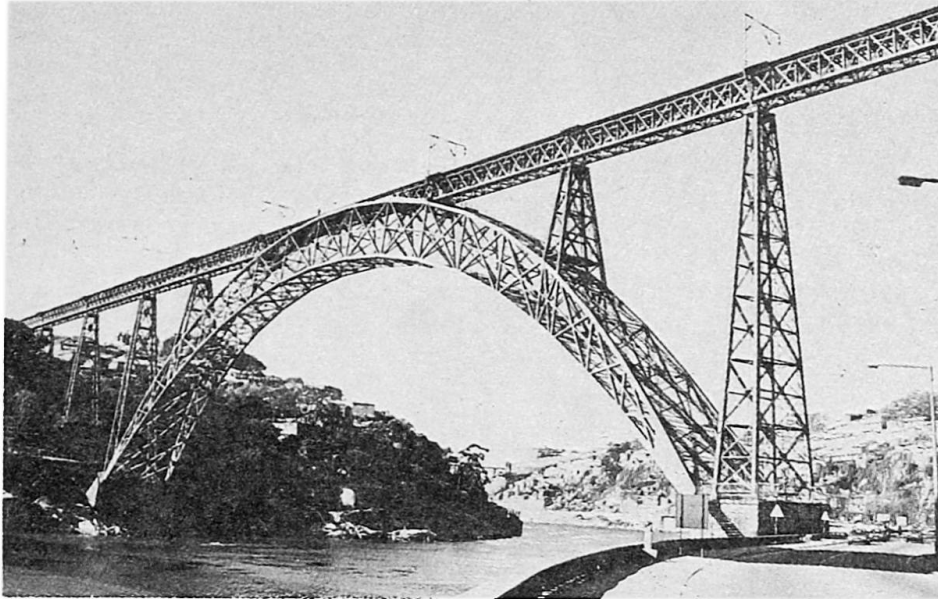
Gustave Eiffel 1877 Maria Pia Bridge.
